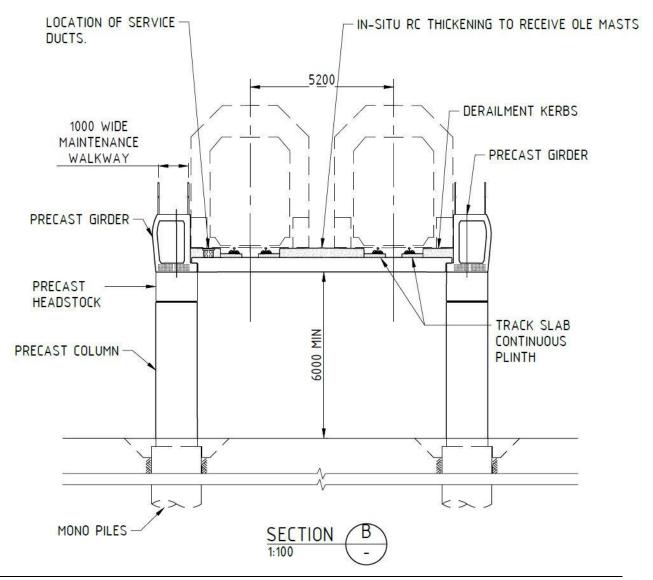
Elevated Cross Section of Modular Viaduct Structure with Two Tracks
